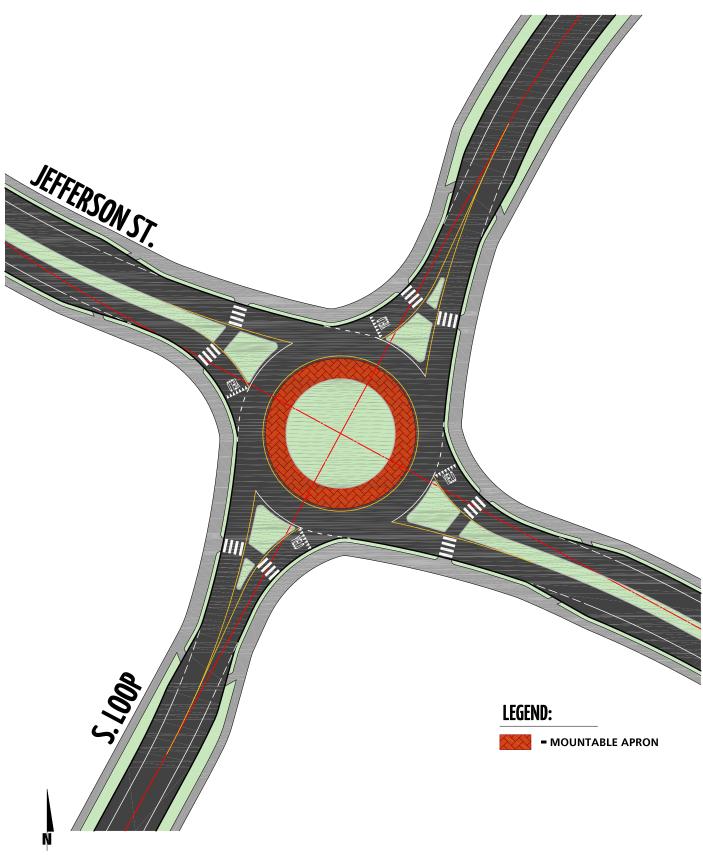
JEFFERSON STREET AT SOUTH LOOP ROUNDABOUT DESIGN FEATURES
